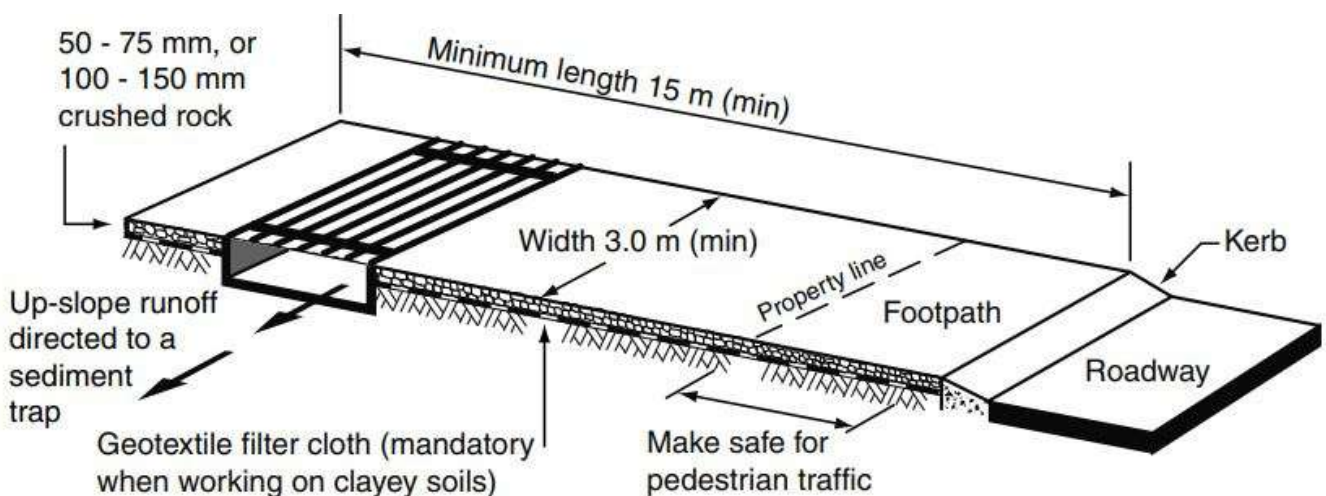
Typical layout of a rumble grid on a large construction site. *Figure from Catchments and Creeks Pty Ltd.
